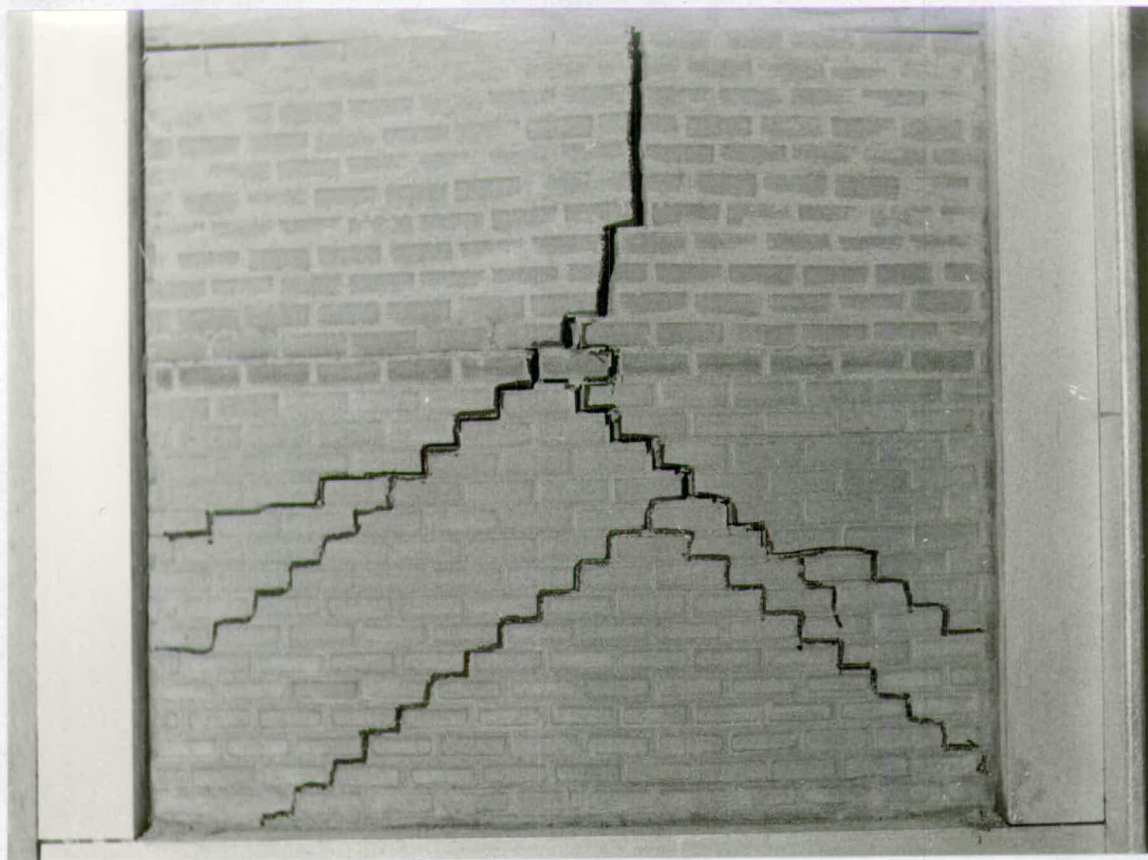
FAILURE OF WALL A2 - 3 SIDES SUPPORTED
